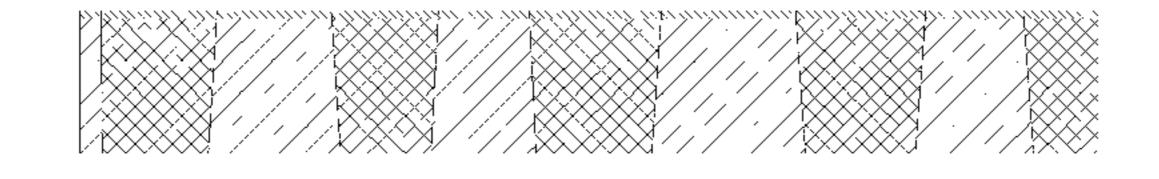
is a top plan view of the laminated roof shingle showing my new design according to a seventh embodiment.
